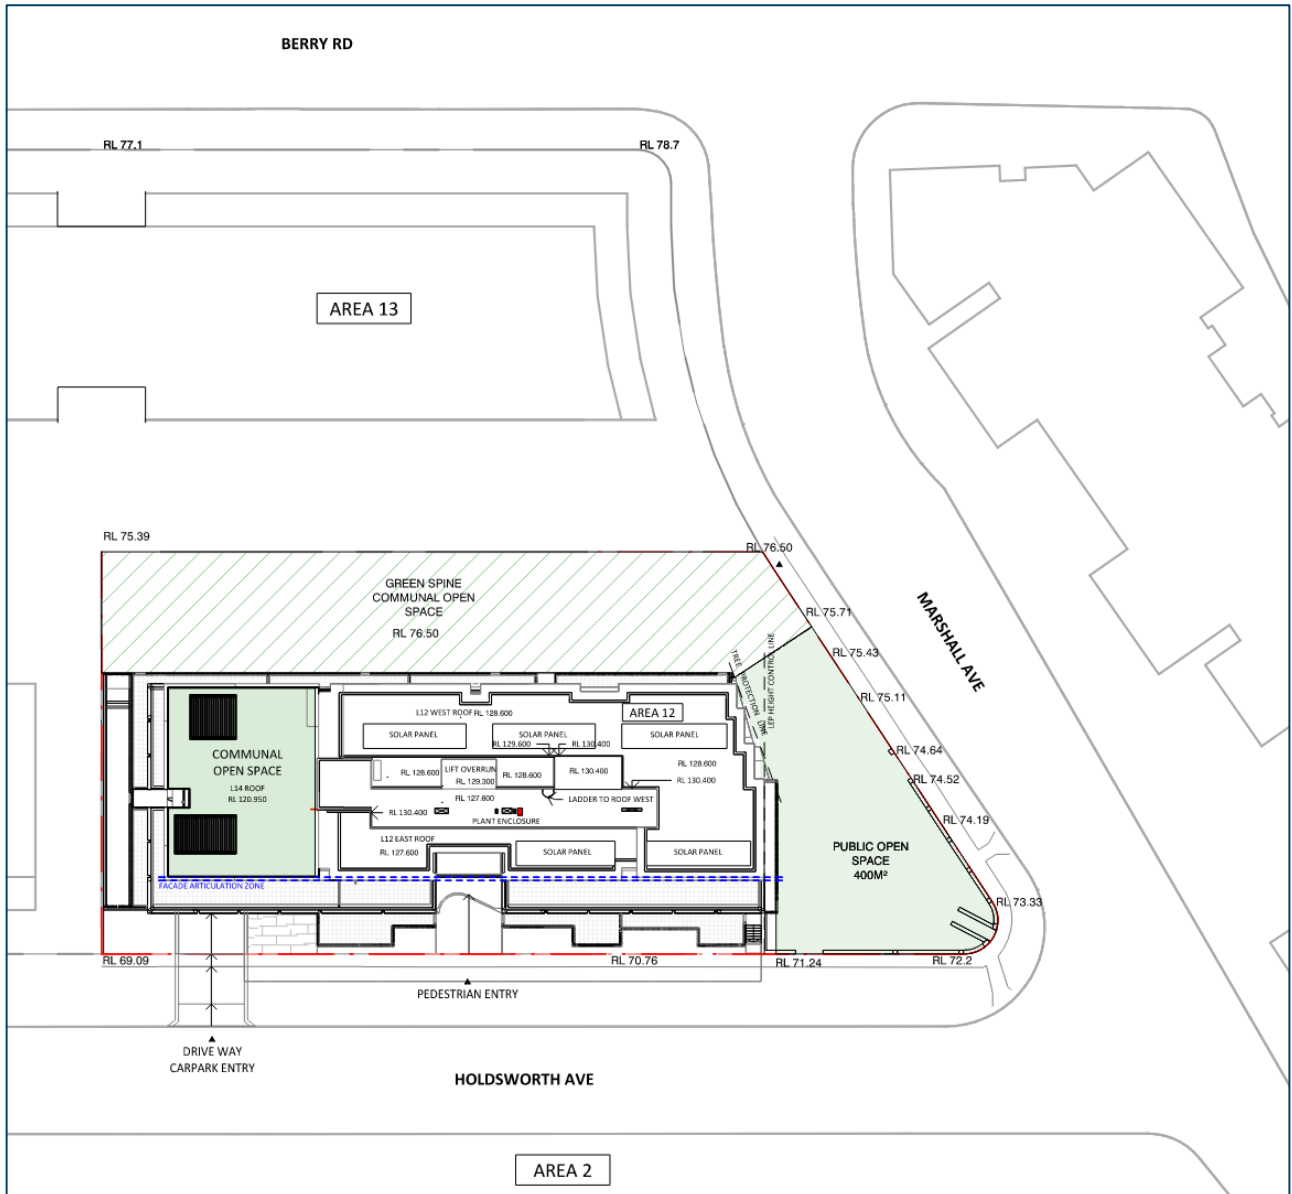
Site Location Plan (courtesy of PTW Architects)
